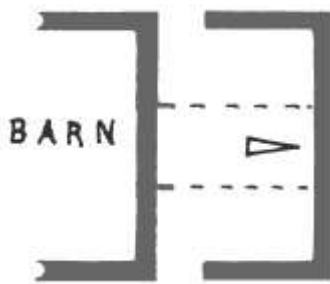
Plan, Type 1, Haygrove, Linton, 1790
